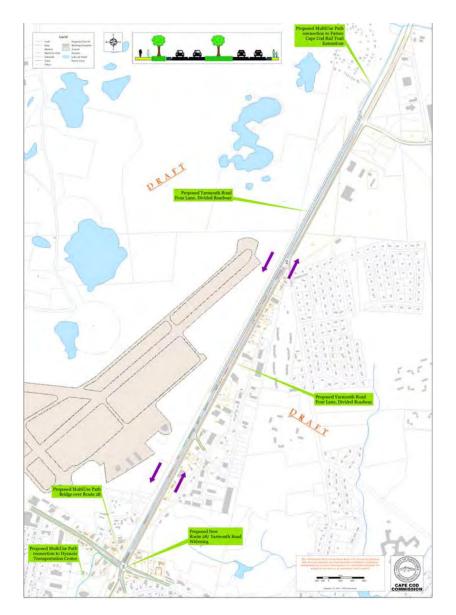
YARMOUTH ROAD RECOMMENDED CONCEPT PLAN
